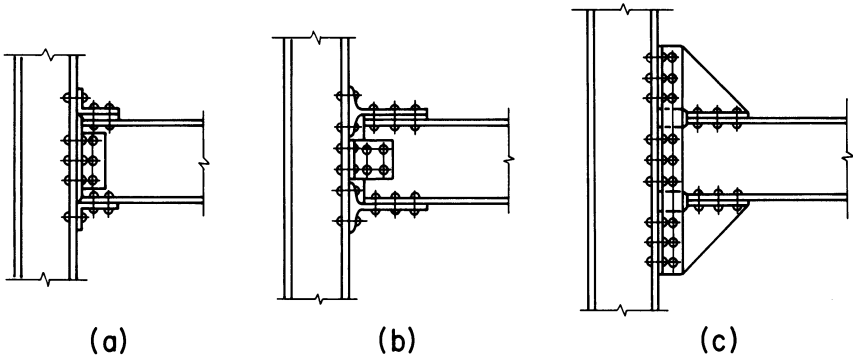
Typical wind bracing connections circa 1930s (After AISC, 1934.)
